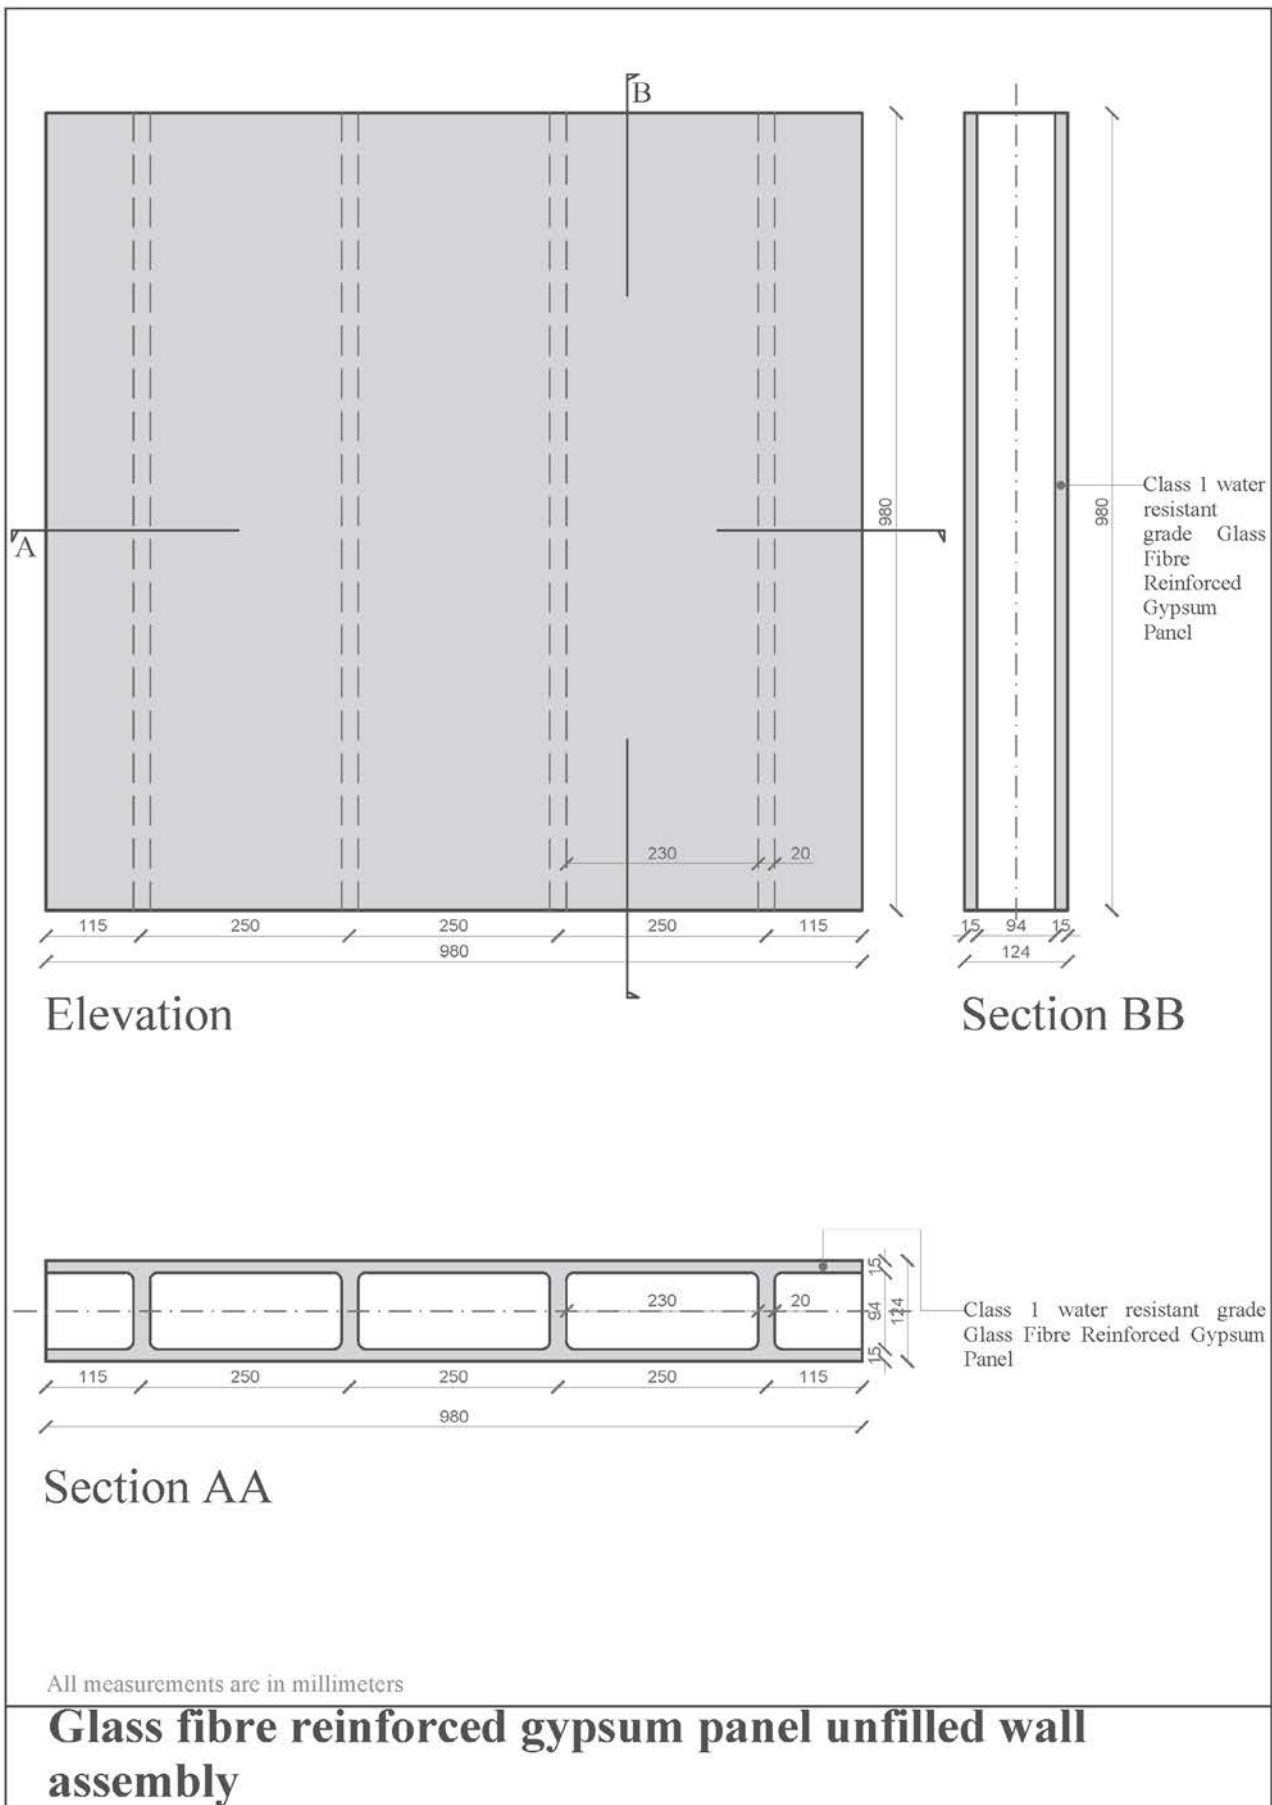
Schematic drawings of Glass Fibre Reinforced Gypsum building Panel wall sample; Class-1 unfilled panel, as per specifications and drawings found in BMTPC Performance Appraisal Certificate (PAC) no: 1009-S/2012 and structural design manual.
